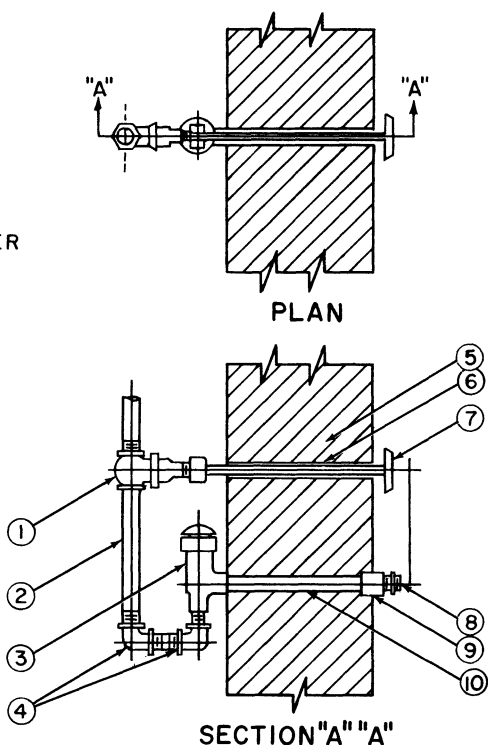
Vacuum breaker arrangement for outside hose hydrant.
